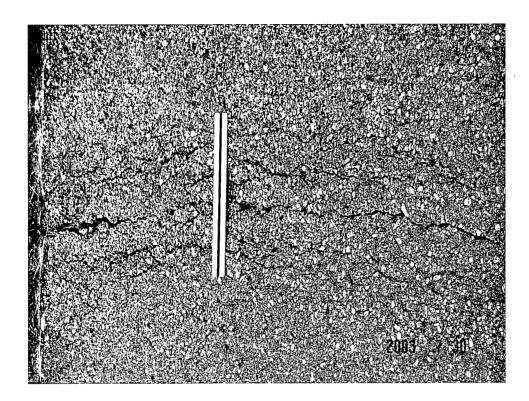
1/4-Inch Transverse Crack with Adjacent Fatigue Cracking
